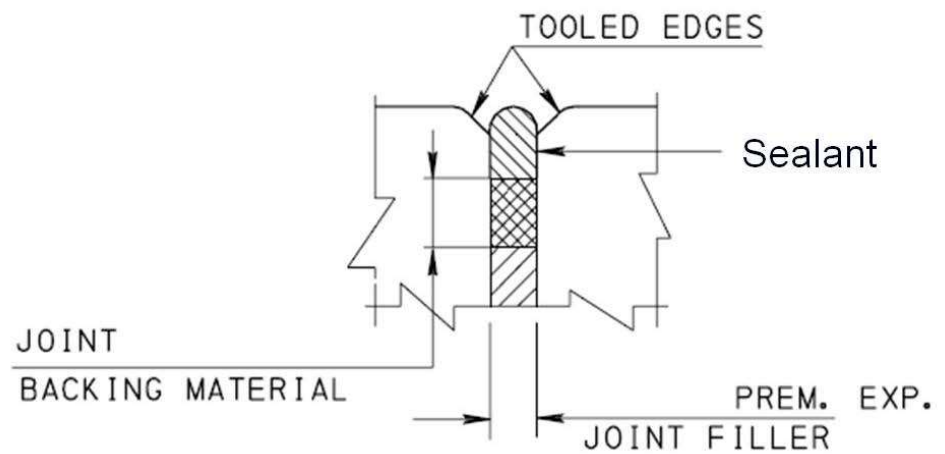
Cross Section of a Pourable Joint Seal
